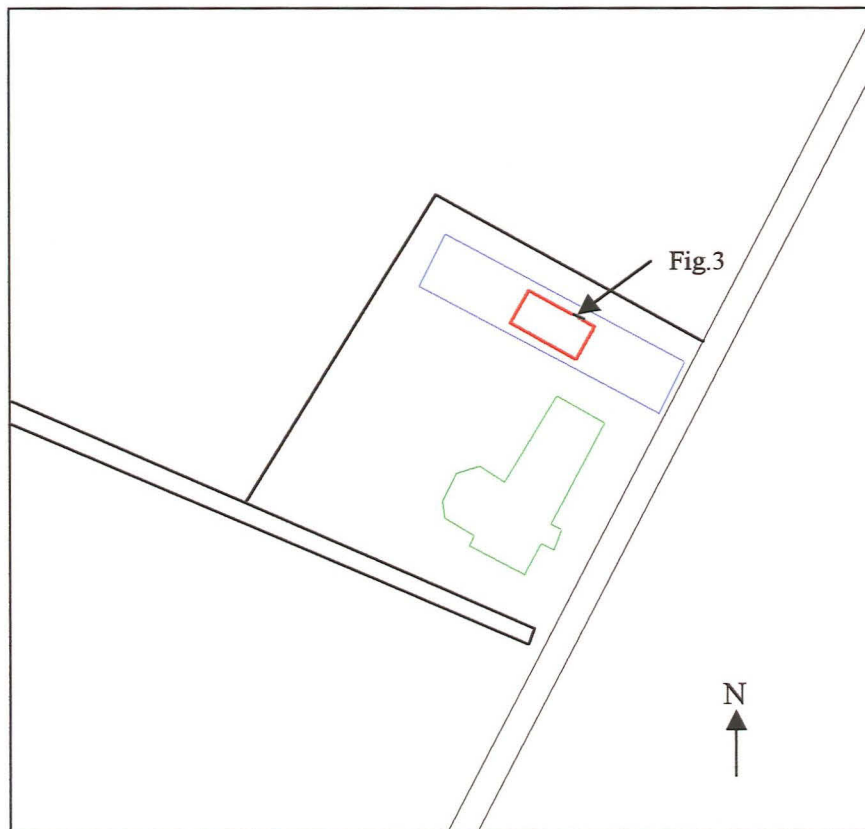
Scale 1:1000. Plan showing location of existing bungalow in green, construction trench for swimming pool in red; and swimming pool building in blue
